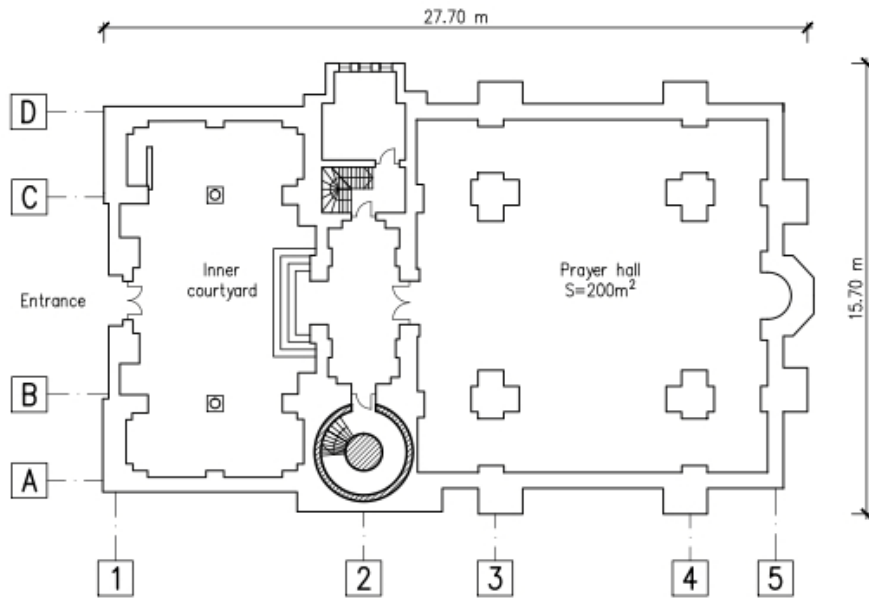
Ground floor layout of "Carol I" Royal Mosque in Constanța
